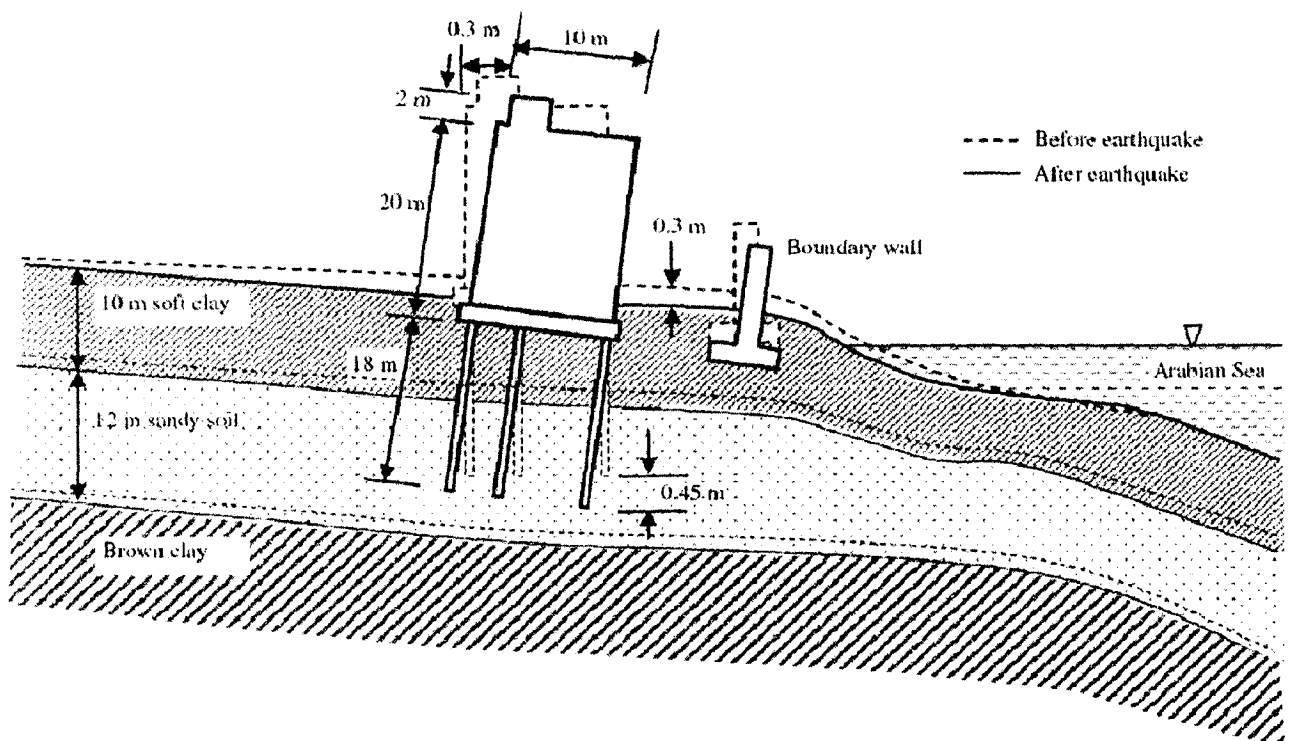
Plausible Settlement Mechanism of Failure Showing the Tilting of the Tower assuming no Structural Failure of Piles (Dash et al. 2009)
